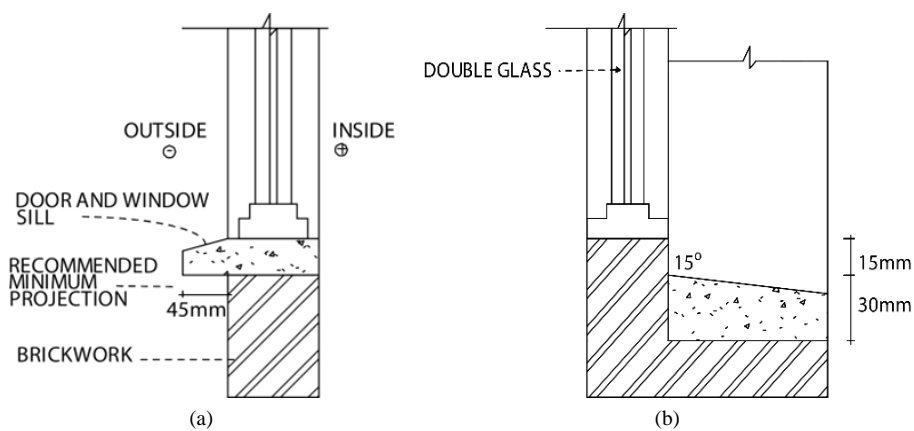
(a) Windowsill Detail, (b) Windowsill Detail 2
